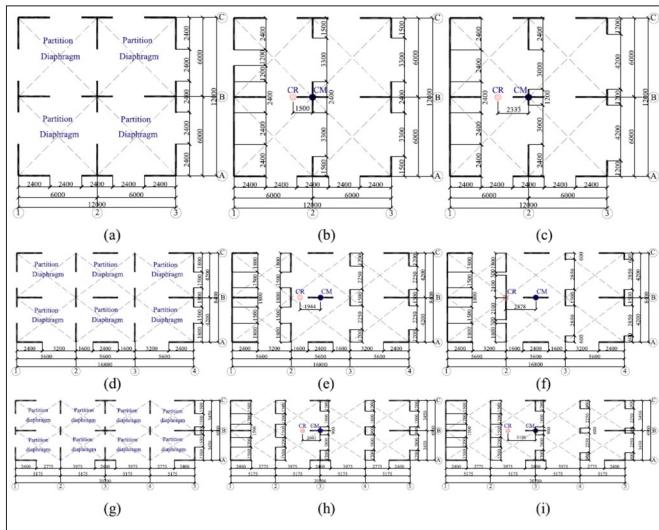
Three groups of single-storey baseline houses with different bracing wall layouts [68].
